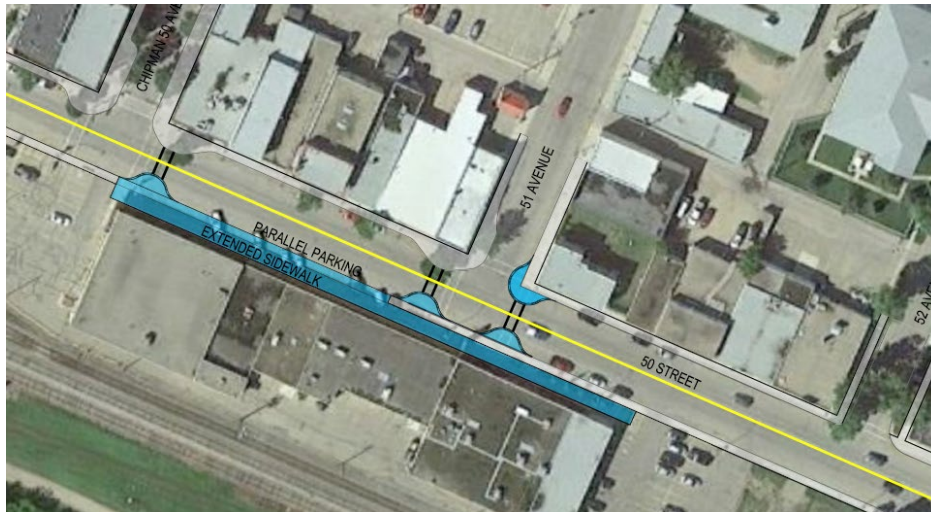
50 STREET CORRIDOR PROPOSED CONCEPT IMPROVEMENTS
